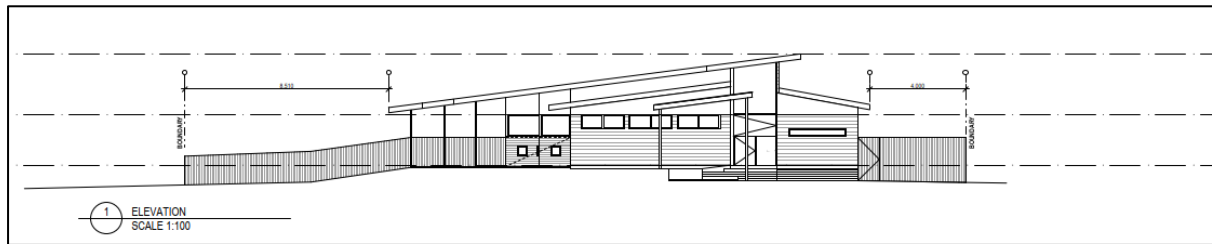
Elevations - Approval Plans (Source: Deborah Fisher Architect 2007)
